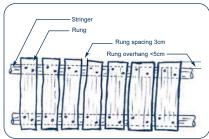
BRIDGE STRINGER SUPPORT AND CROSS BRACING
